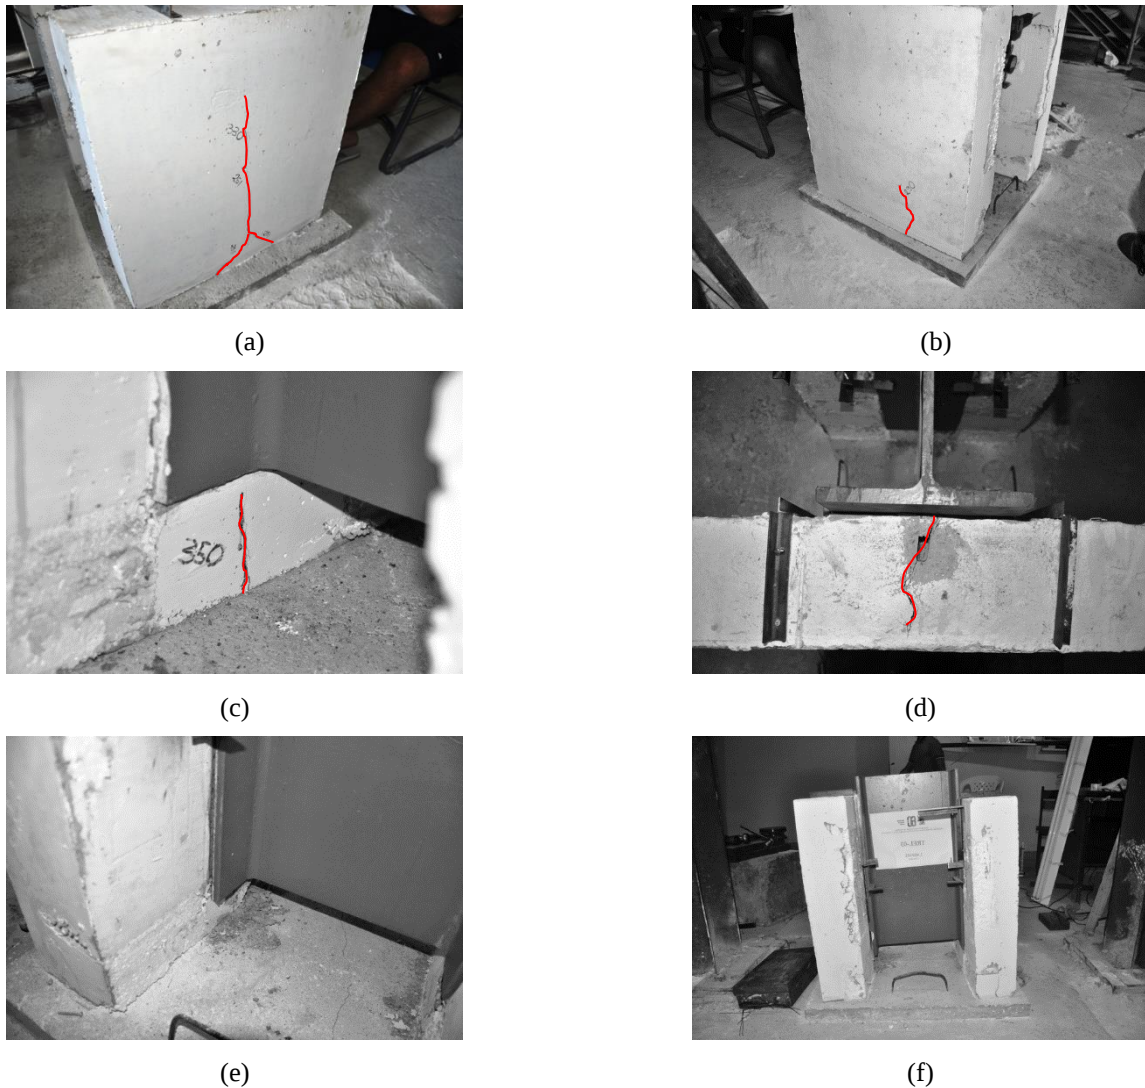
Failure surfaces – TREL specimens. (a) and (b) longitudinal cracks; (c) failure at the concrete block – crack orientation on the cross section; (d) crack at the top of slab; (e) failure at the concrete block; (f) asymmetry behavior of the specimen.
